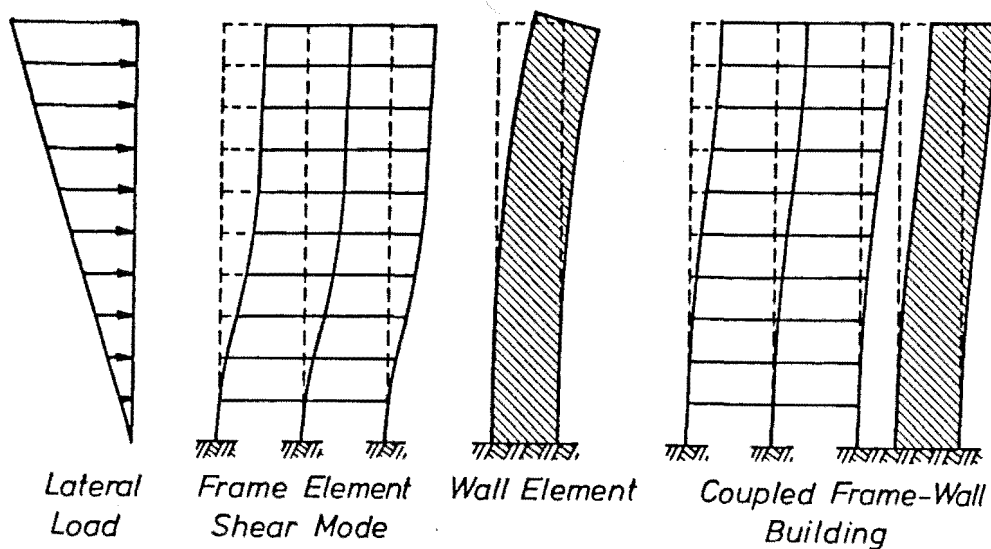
Deformation Patterns of Frame, Wall, and Coupled Frame-Wall Elements.
